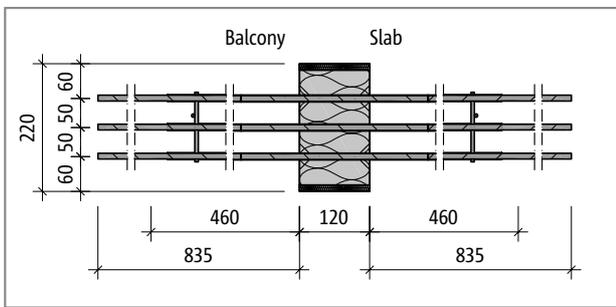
Schöck Isokorb® XT type B: Product plan view
